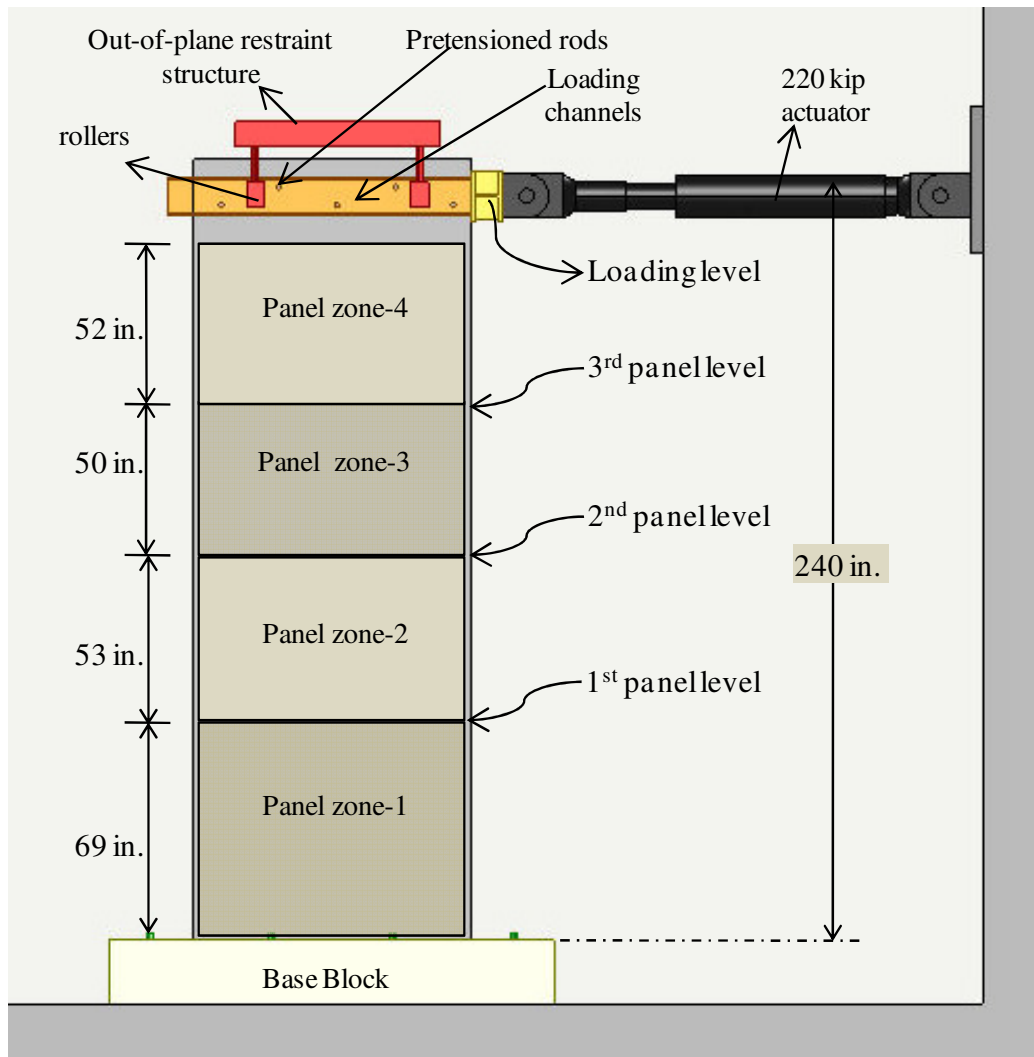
Schematic of the test setup used for the rectangular wall tests
